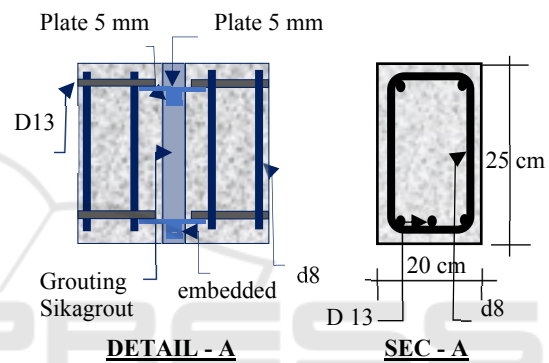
Detail and Section of element precast type L Joint concrete beam.
